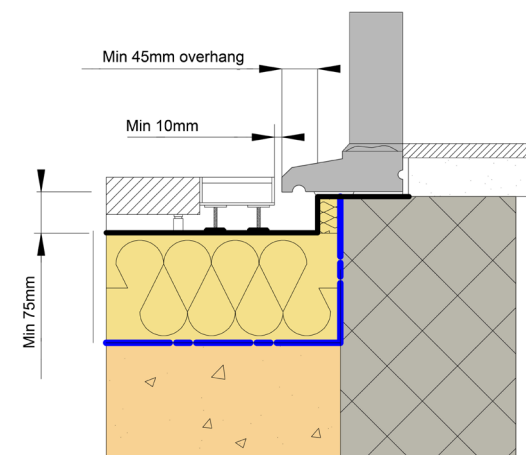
Upstand at door access: warm deck roof / balcony 'Level threshold'
